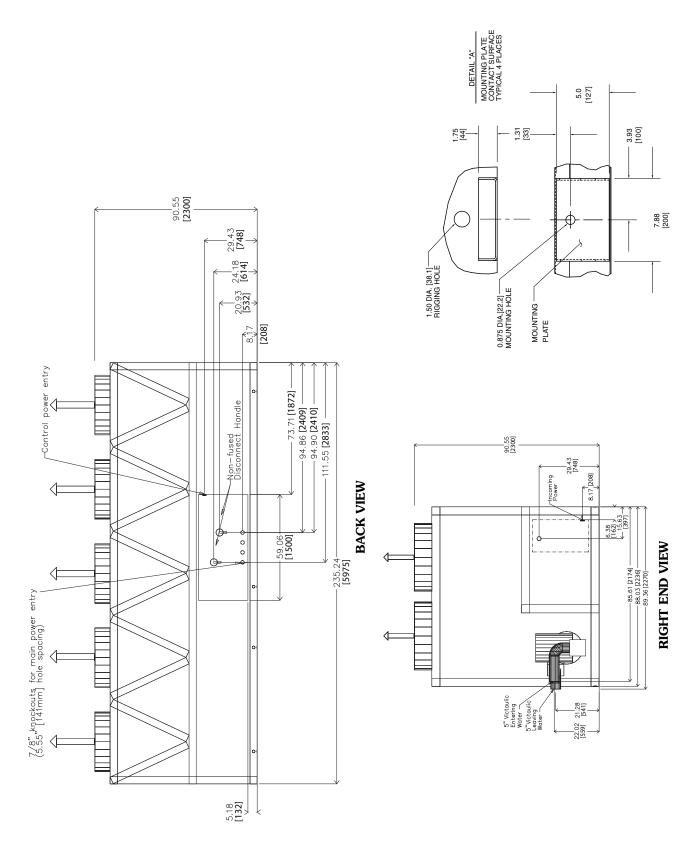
30XA140,160 Air-Cooled Liquid Chiller with Pump Dimensions (cont)
